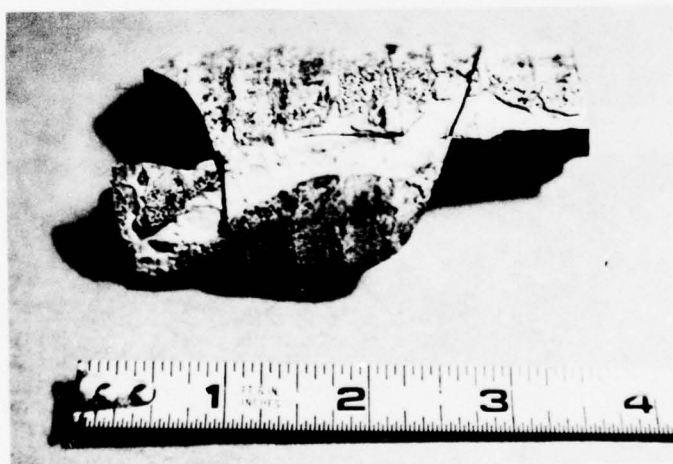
Air voids found at the grout-conduit interface of central section of beam 19
